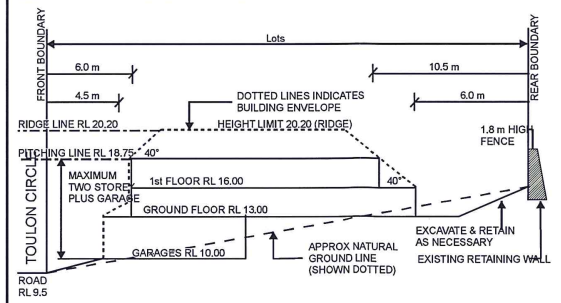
Horizontal & Vertical Building Envelope Lot 67 - 72 Anchorage Drive
